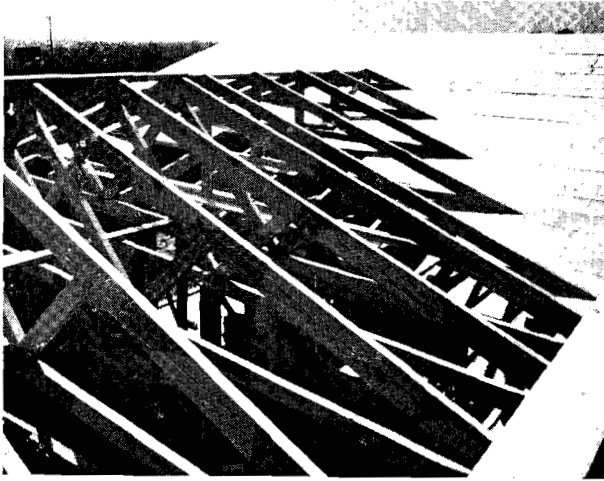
UNICOM roof framing showing standard full span trusses meeting standard valley trusses in an L-shaped house.
